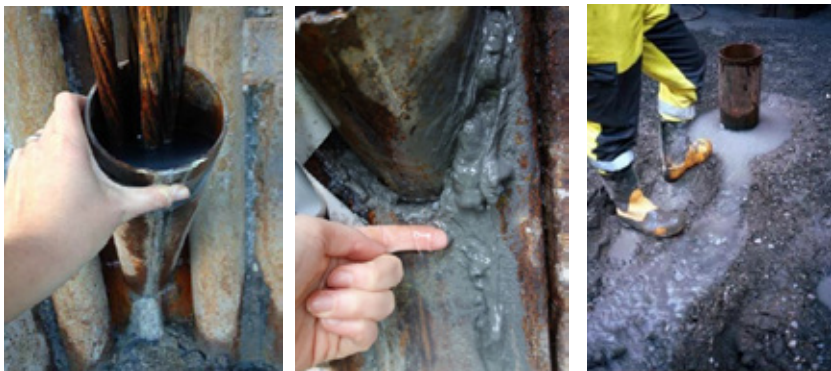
Example of leakage of water around and through casings for tie-back anchors and drilled steel core piles.
